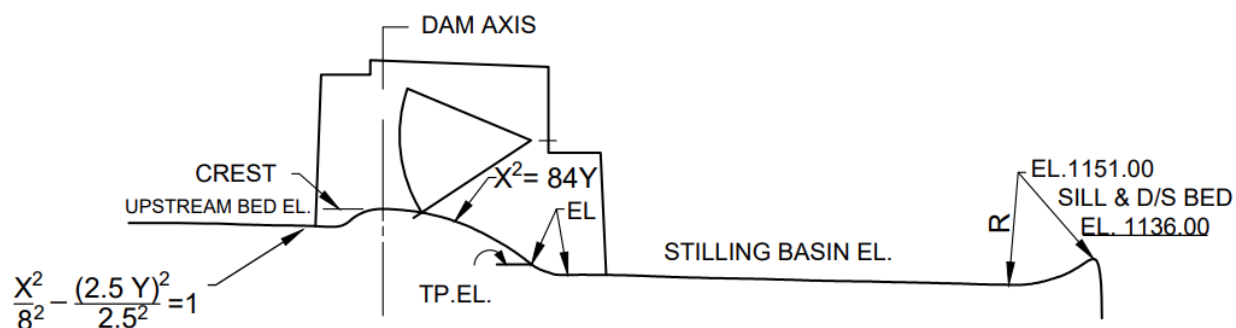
TYPICAL CROSS – SECTION OF SPILLWAY AND STILLING BASIN WITH CYLINDRICAL END SILL
